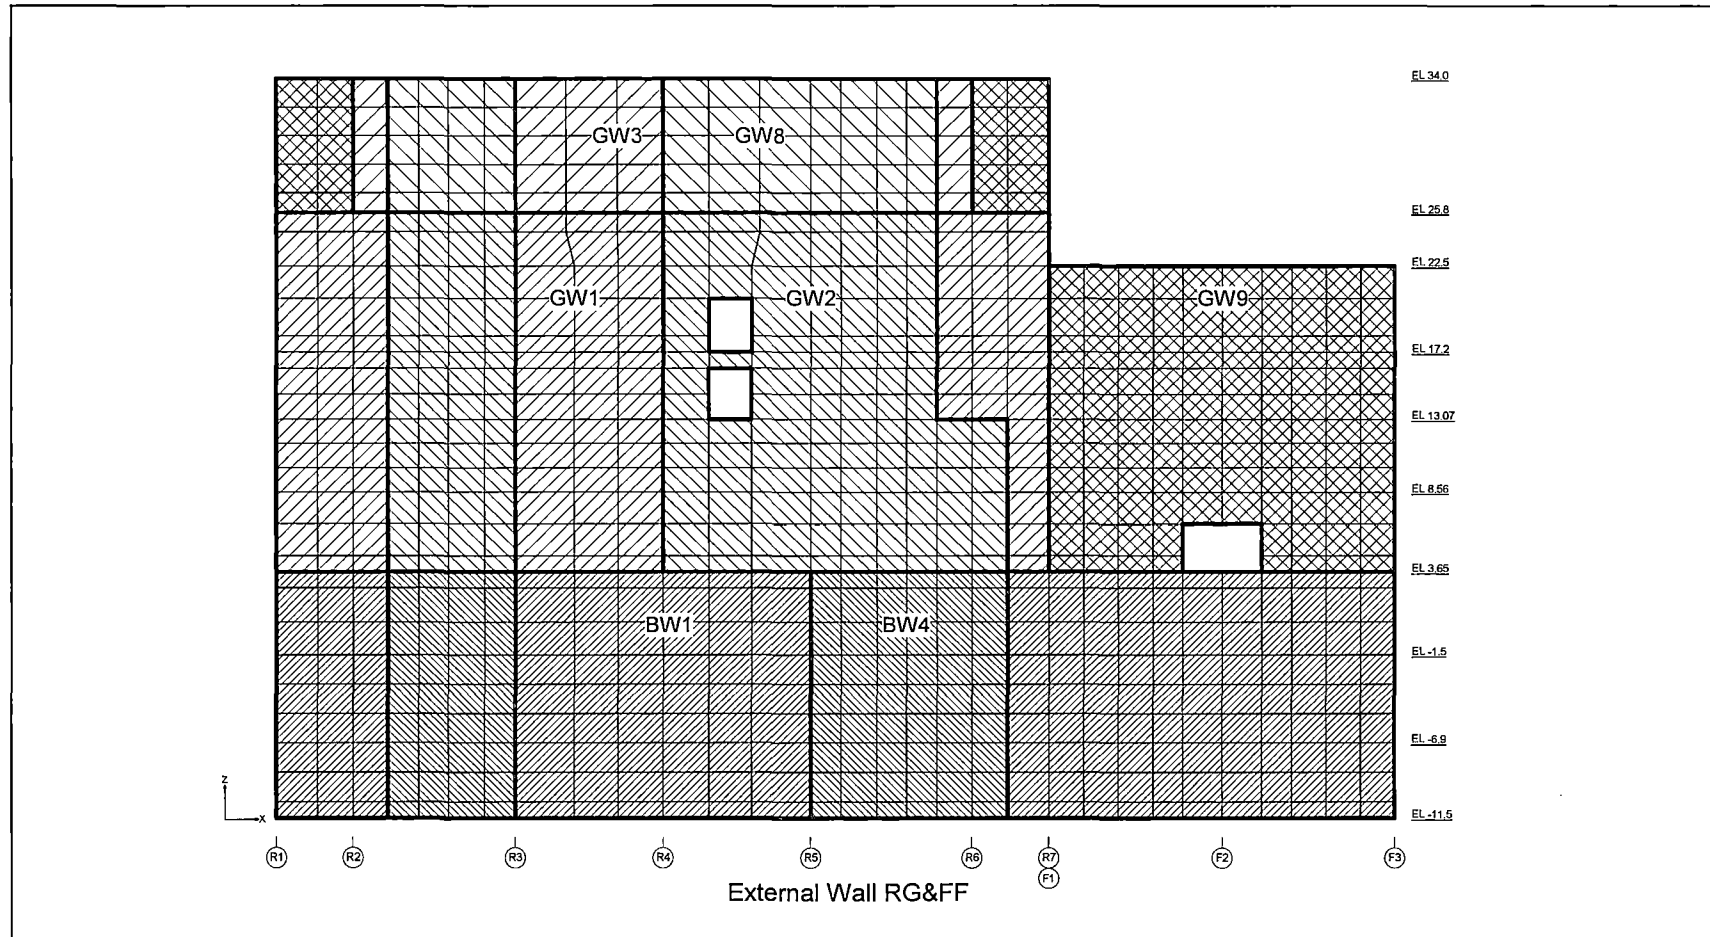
Application of Thermal Load on the External Wall (RG/FF)
